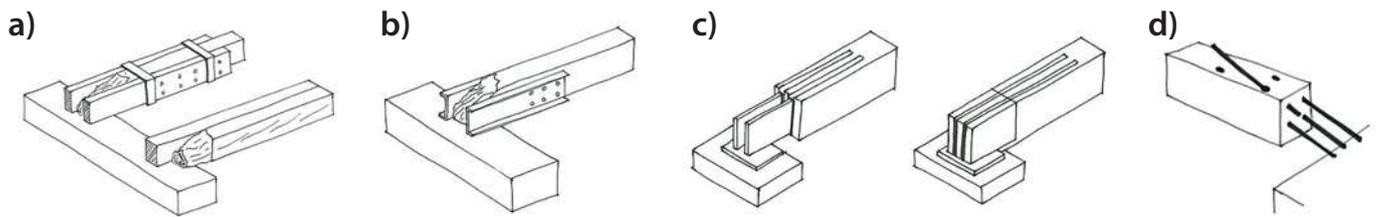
Examples of end-beam repair techniques (prosthesis) using different materials and methods [9]: (a) new timber elements connected to the sound part of the original timber with steel straps, plates, and steel fasteners; (b) new steel elements used to replace the decayed timber; (c) glued-in plates connecting the prosthesis to the sound part of the original timber; (d) glued-in rods connecting the prosthesis made either of wood or resin.
